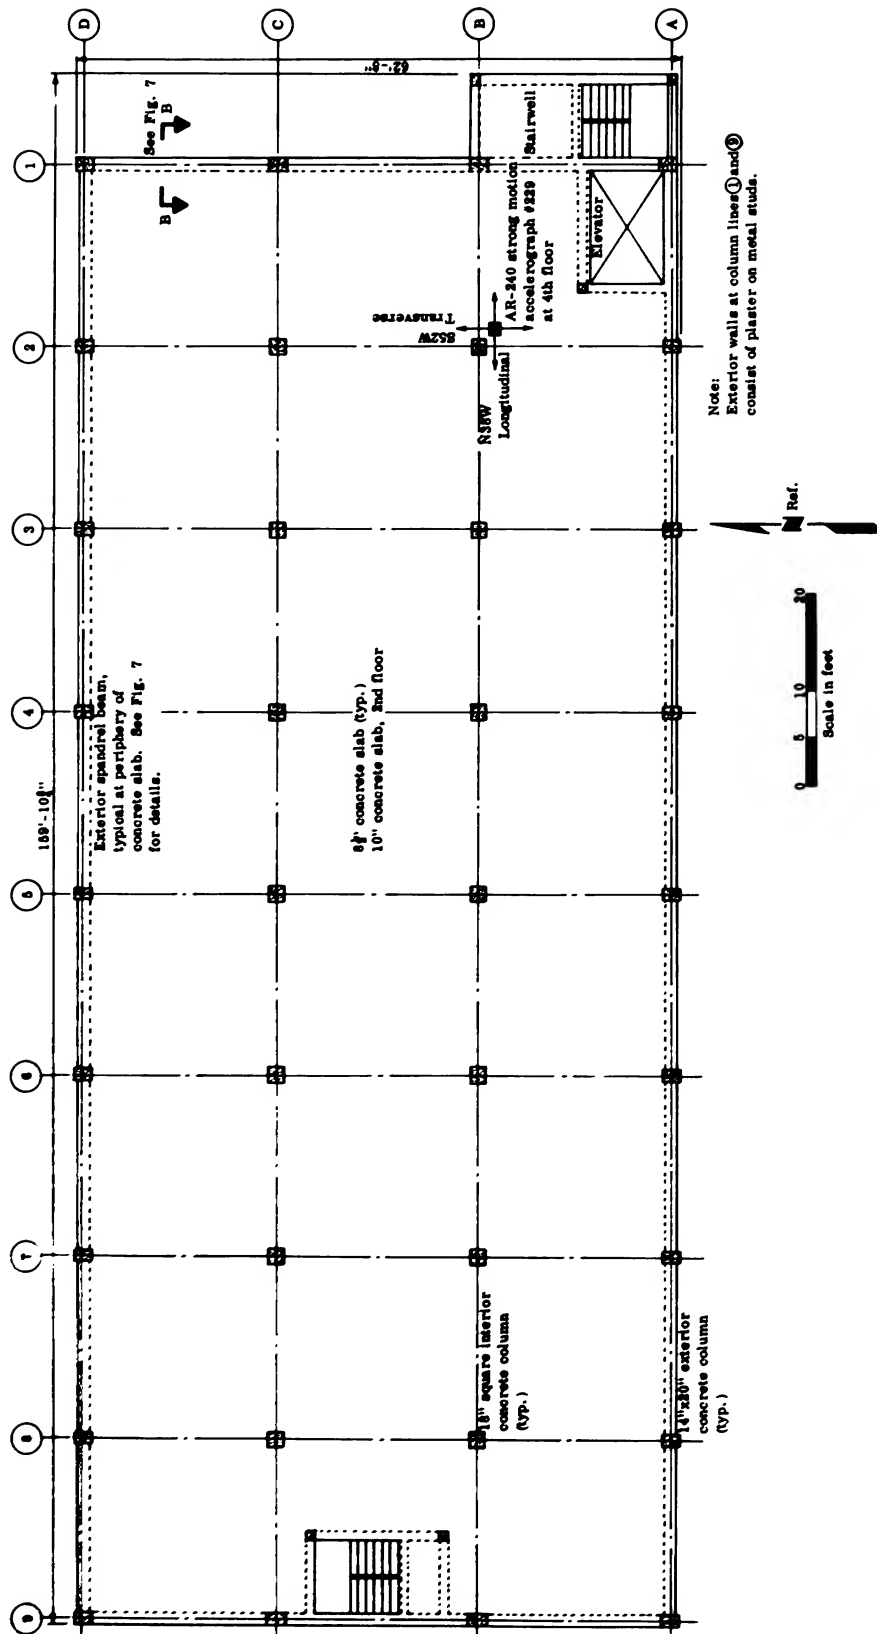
Holiday Inn, Marengo Street. Typical floor framing plan.
